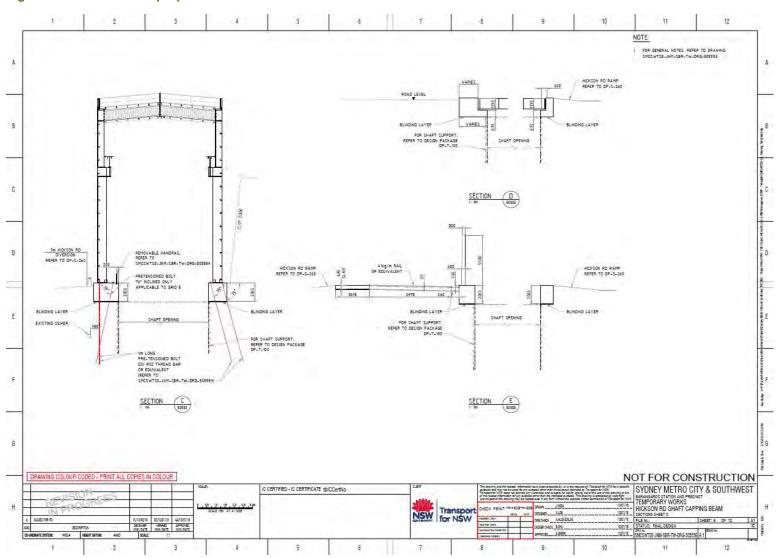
Sections of the proposed acoustic enclosure on Hickson Road
